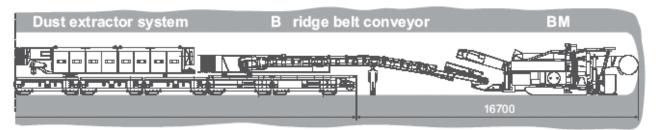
Roadway development system: Bolter Miner+ Self-Advancing Conveyor Head of main conveyor
